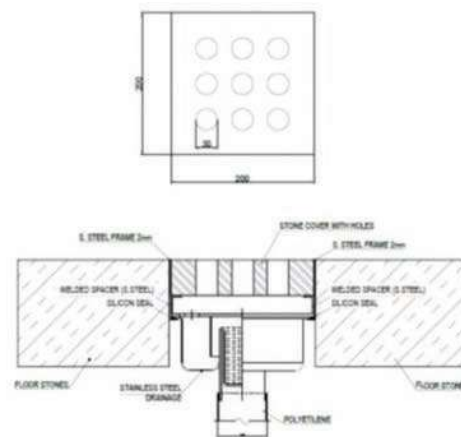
Detail of the customised drain outlet for the floor of the Rotunda and adjacent areas.
